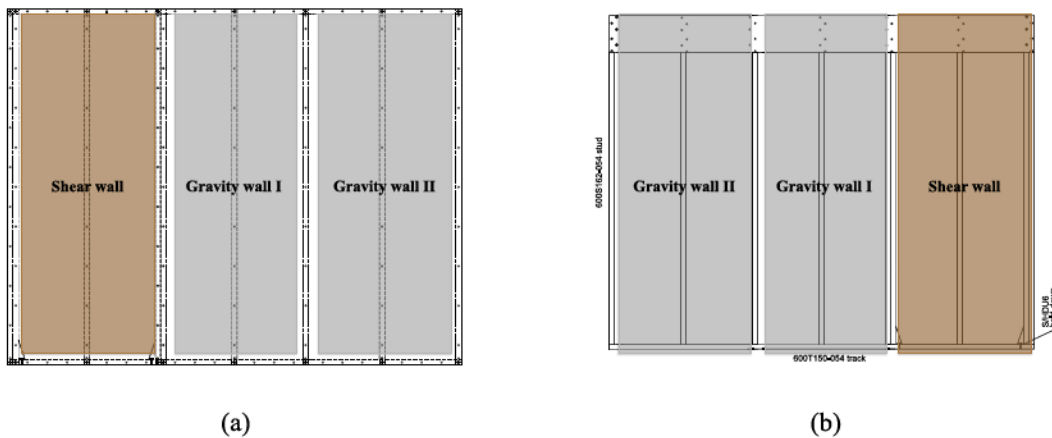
Wall system configuration: (a) exterior side; (b) interior side
